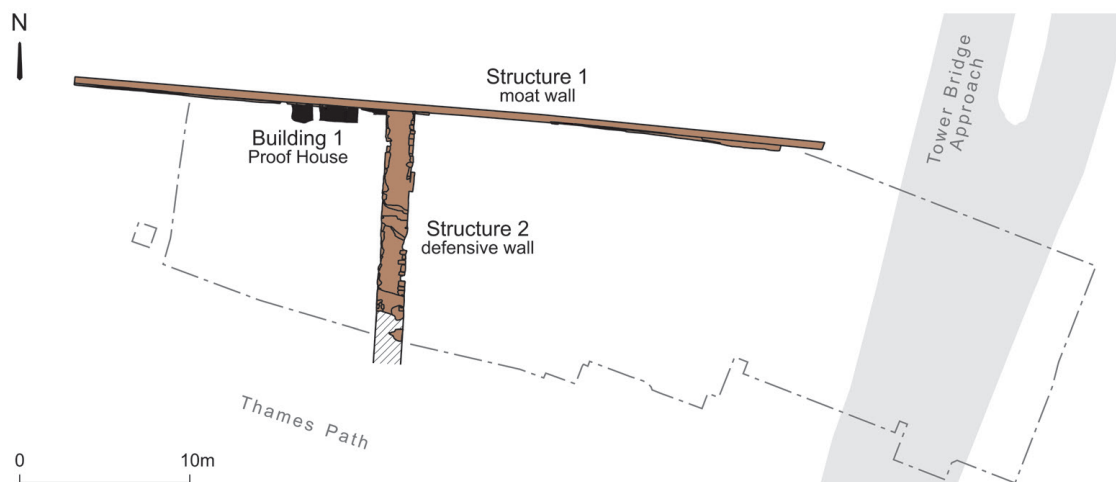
Moat wall (S1), defensive wall (S2) and Proof House (B1) (period 1) (scale 1:500)
